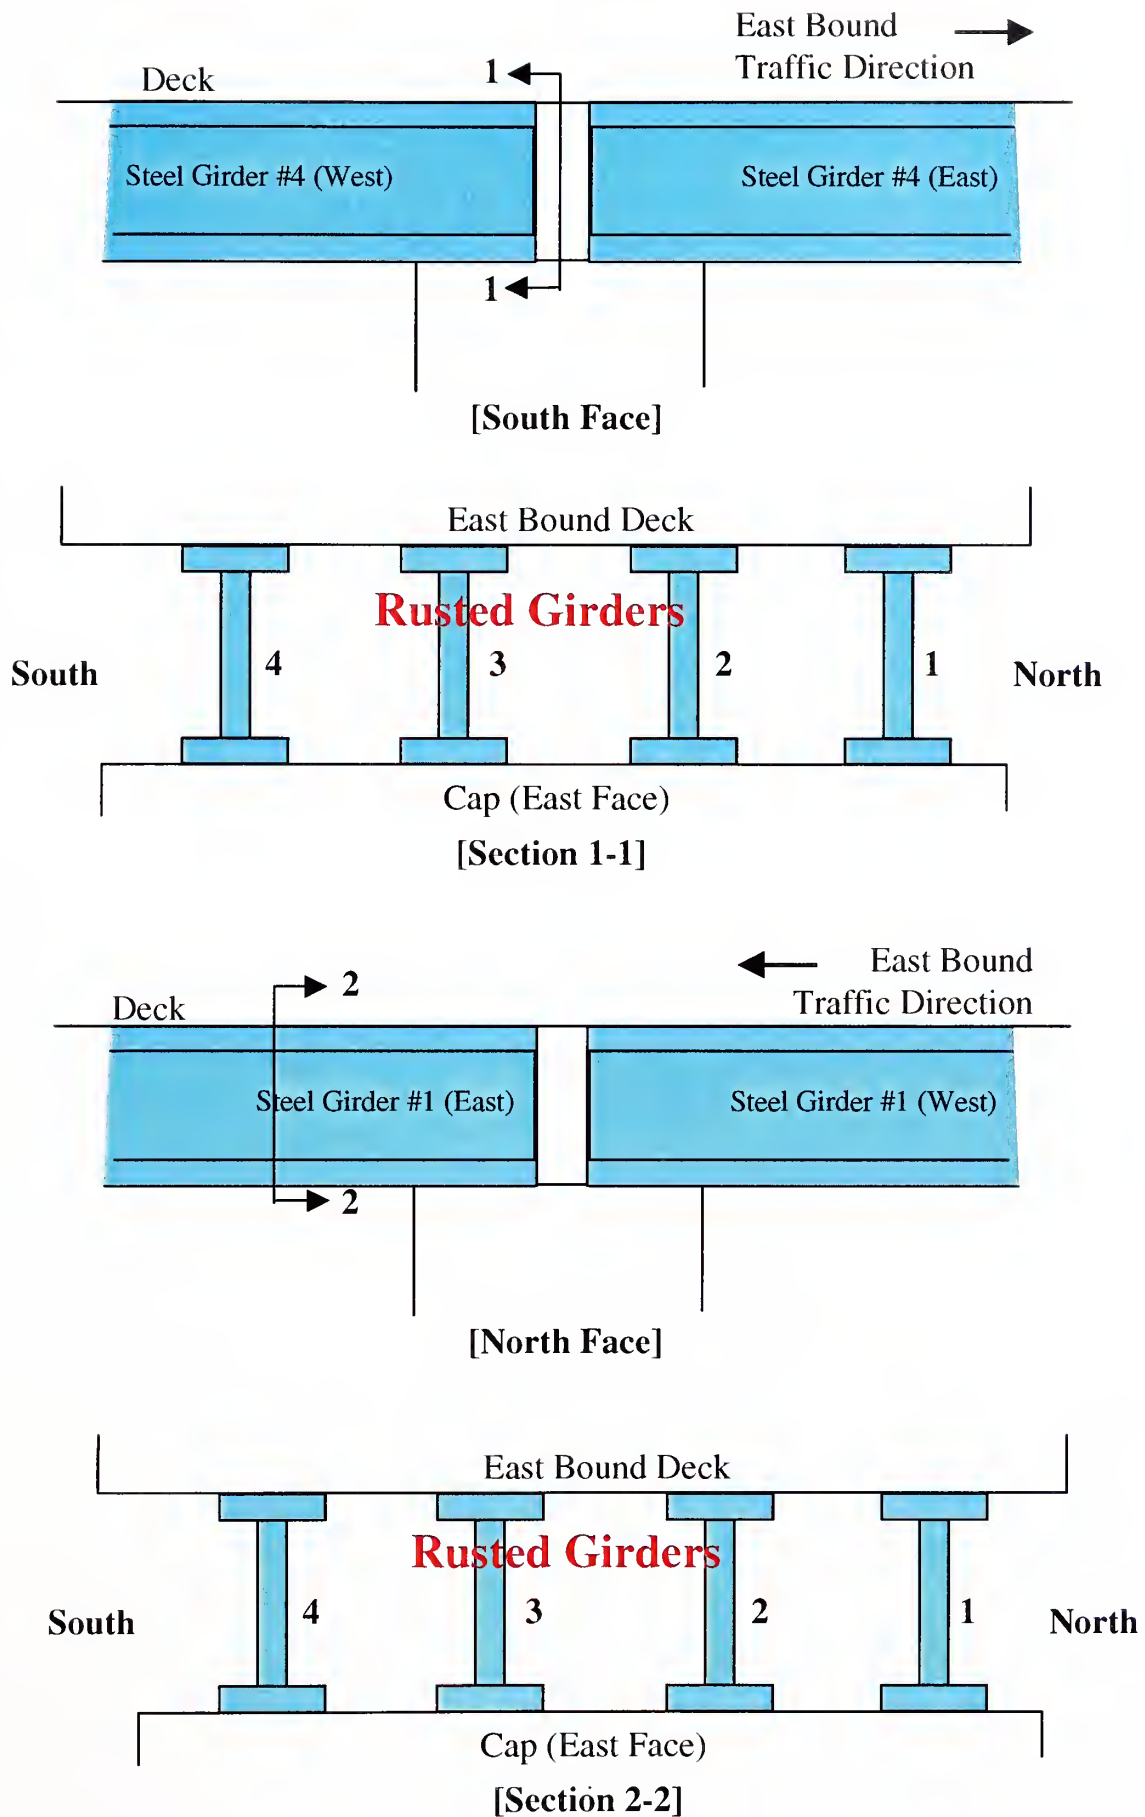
B. Condition of Girder Joints over Bent No. 15 (East Bound).
